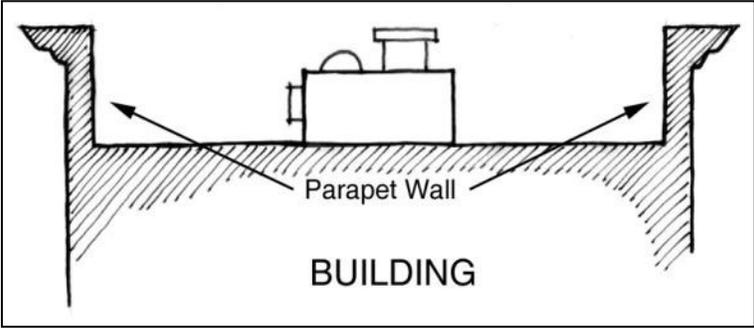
J: Example of how parapet walls are utilized to screen roof mounted mechanical equipment.
